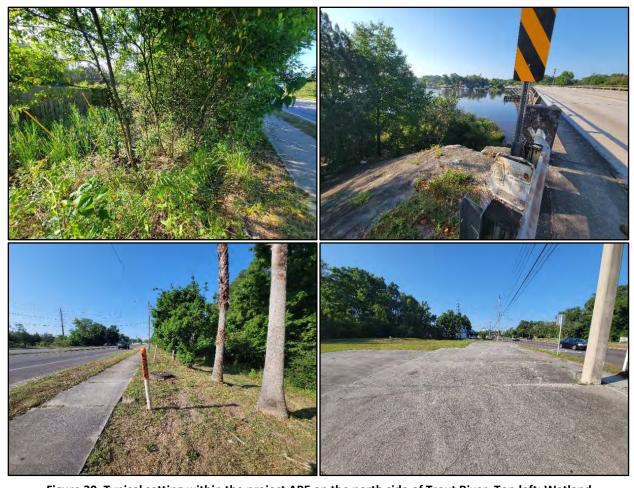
Typical setting within the project APE on the north side of Trout River. Top left: Wetland vegetation and sidewalk, view south; Top right: At the northeast corner of Bridge No. 720033, view southeast; Bottom left: Underground utilities and sidewalk, view south; Bottom right: Hardscape parking lot, view south.
